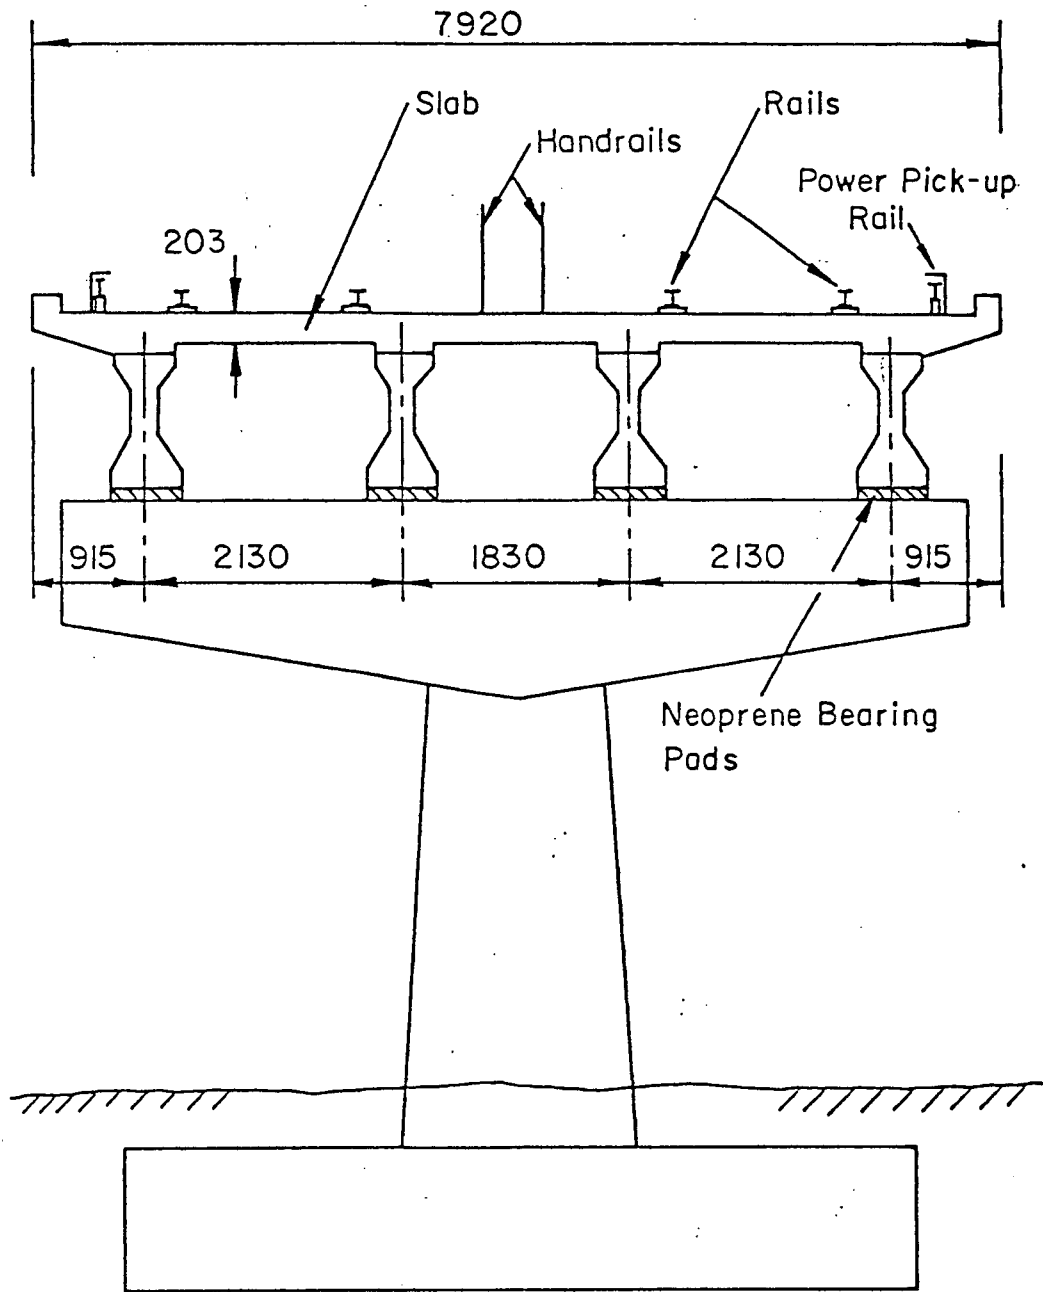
Typical Cross-Section of the 4 I-Beam Span of the Collingswood and Westmont Viaducts
